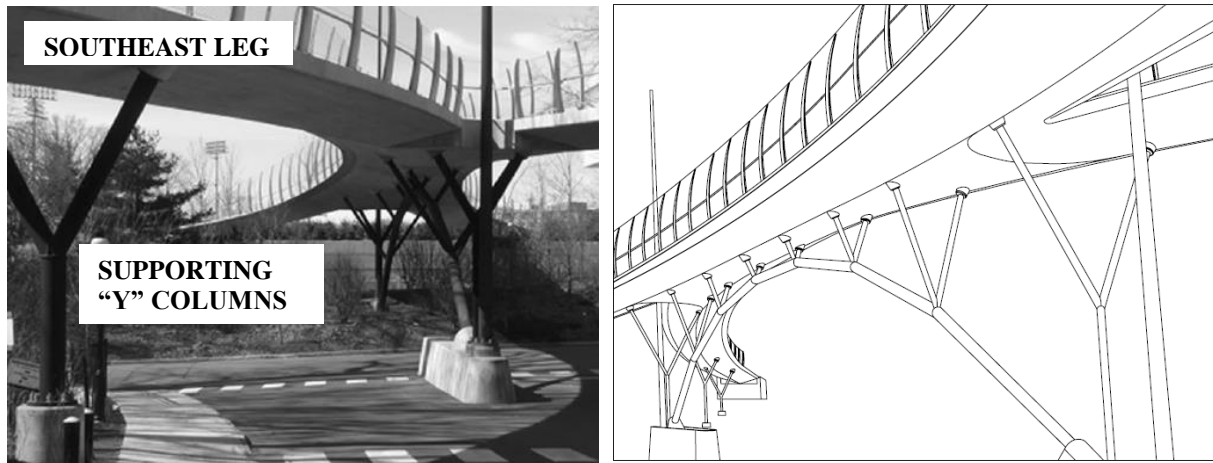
Details of steel columns under the East legs of the footbridge (a) and perspective view of the arch (b).
